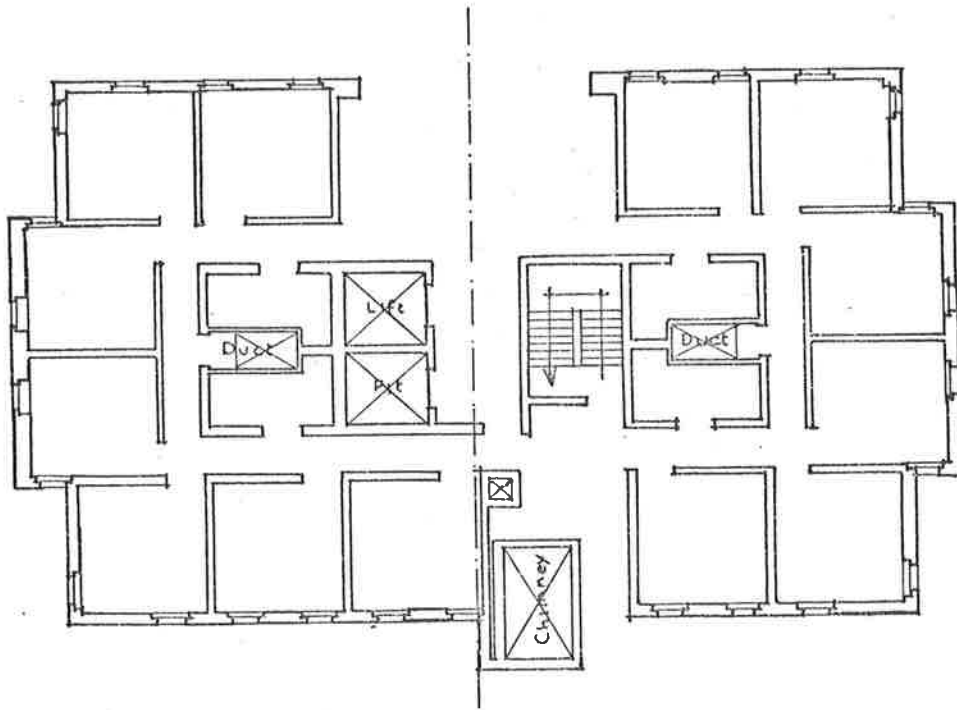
Floor Plan of Residential Blocks at the University of Essex. (Typical for Load-bearing Structural Brickwork.)
